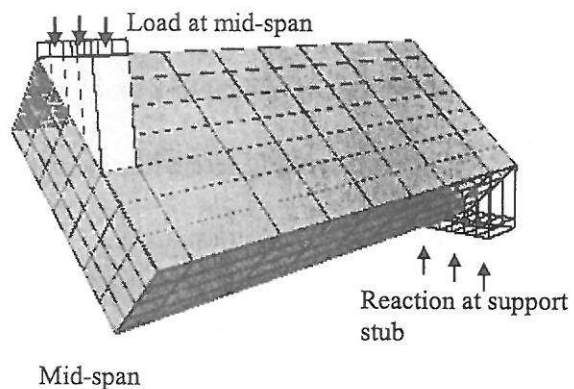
Finite element model of reinforced concrete beam specimens subjected to bi-axial shear (Half specimen)
